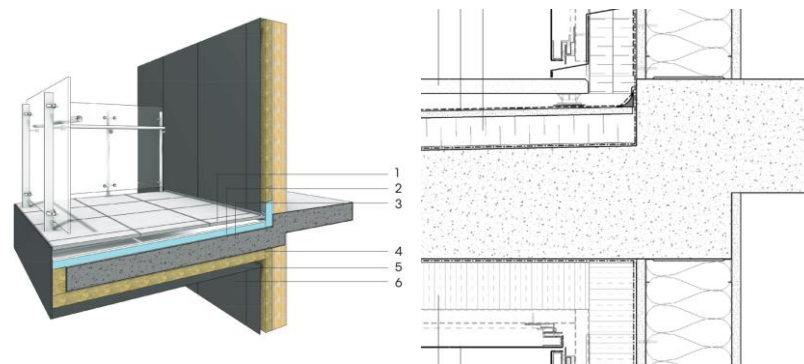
continuous concrete slab (4) with wrapping insulation (3, 5) and protective finishing (1, 2, 6)
